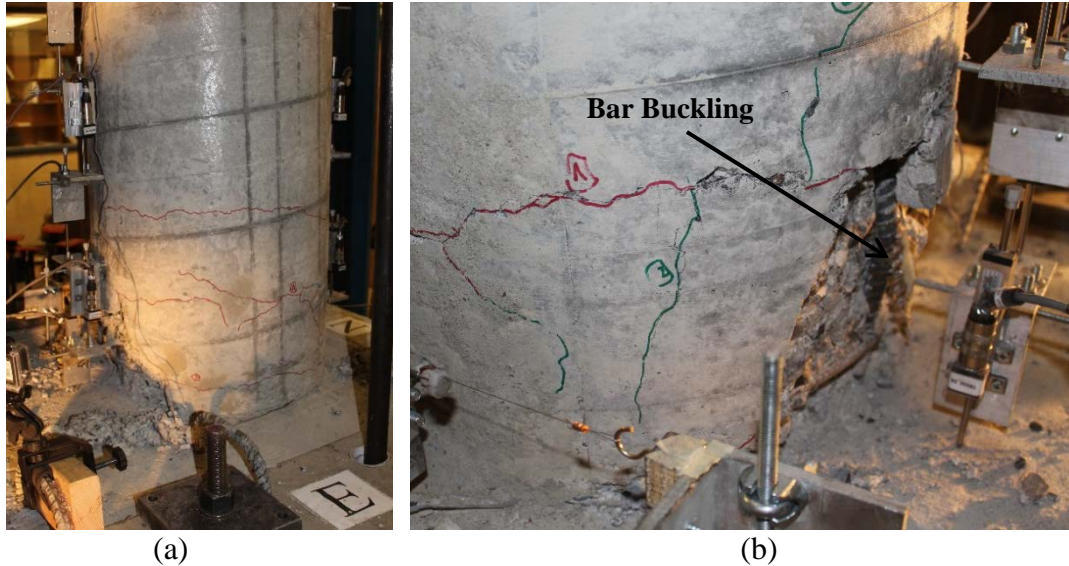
Damage in Column 3 for 1.92 x Iwaki Y. (a) Spalling and crushing of concrete, (b) Bar buckling south side
